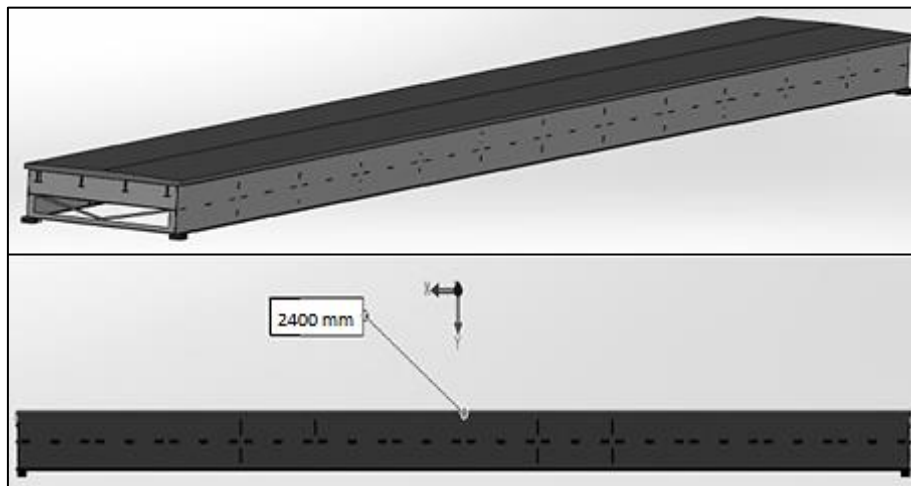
Complete assembled bridge span model (steel structure and bridge deck).
